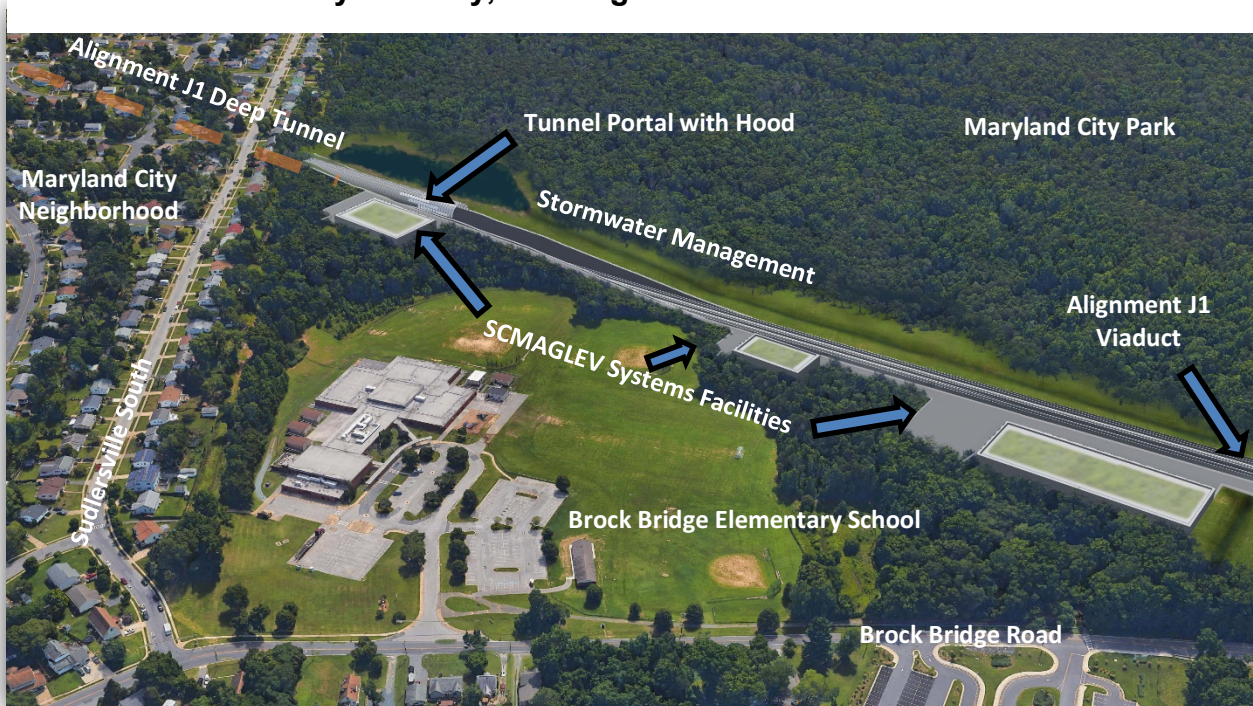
CAA #10 AFTER: Illustrative Rendering of Proposed Build Alignment J1 Tunnel Portal near Brock Bridge Elementary School and Maryland City, Looking East
